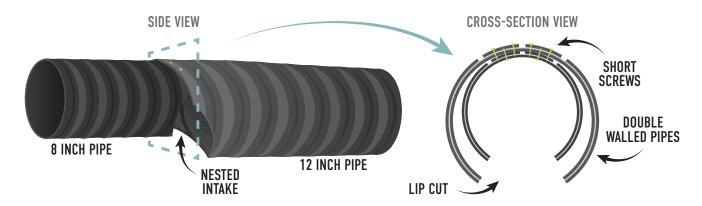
Nested pipe configuration used when constructing a dual-intake pond leveler.
